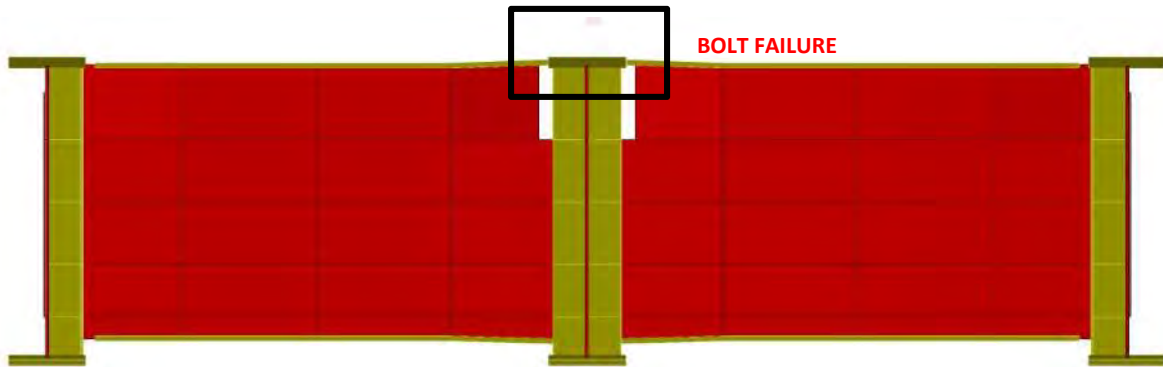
Location of Connection Failure in Redundant Load Path Diaphragm
